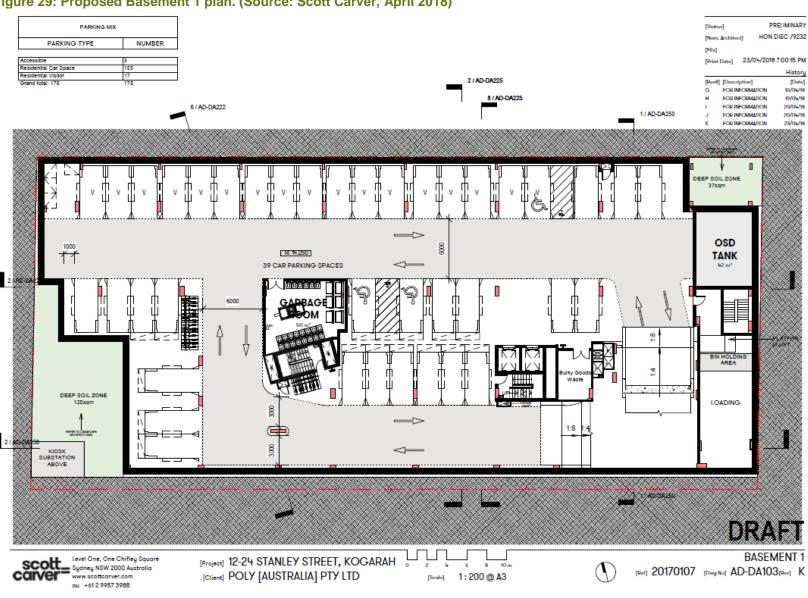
Proposed Basement 1 plan. (Source: Scott Carver, April 2018)
